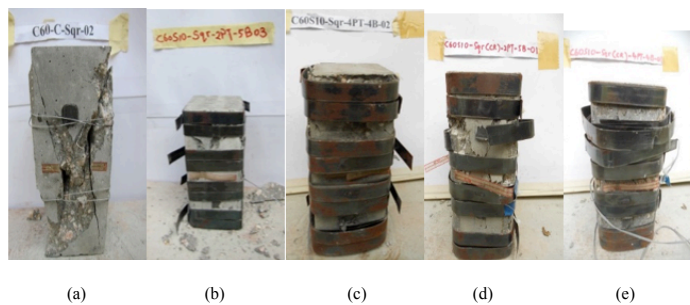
The cracking pattern of: (a) unconfined specimen; (b) two layers steel straps with four Bars confined specimen; (c) four layers steel straps with four Bars confined specimen; (d) rounded corner two layers steel straps with four Bars confined specimen; and (e) rounded corner four layers steel straps with four Bars confined specimen
